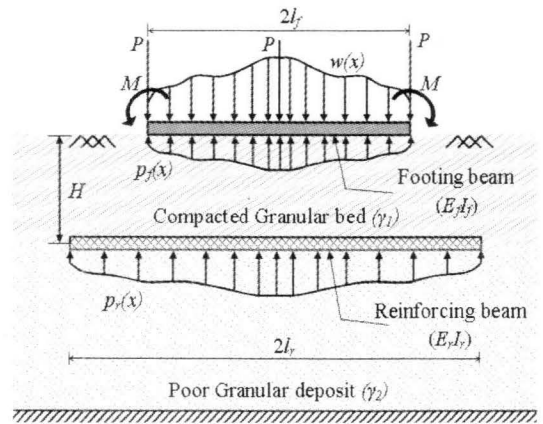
Definition Sketch of the Problem: Beam on Reinforced Elastic Foundations
